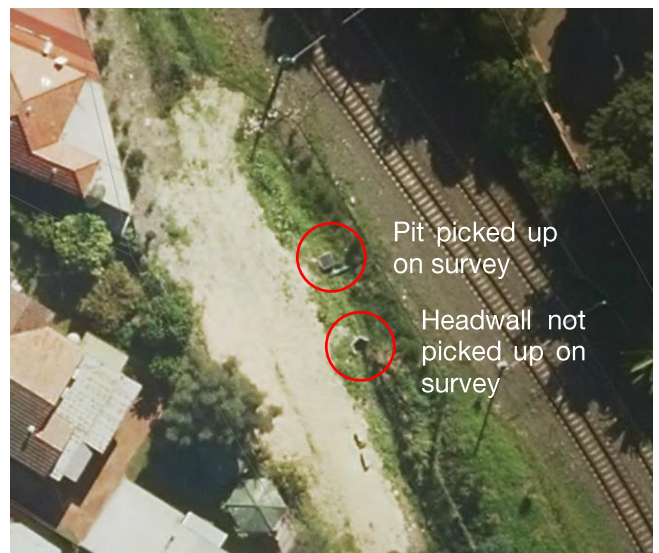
2016 Aerial photo showing headwall behind 45 Hercules Street
